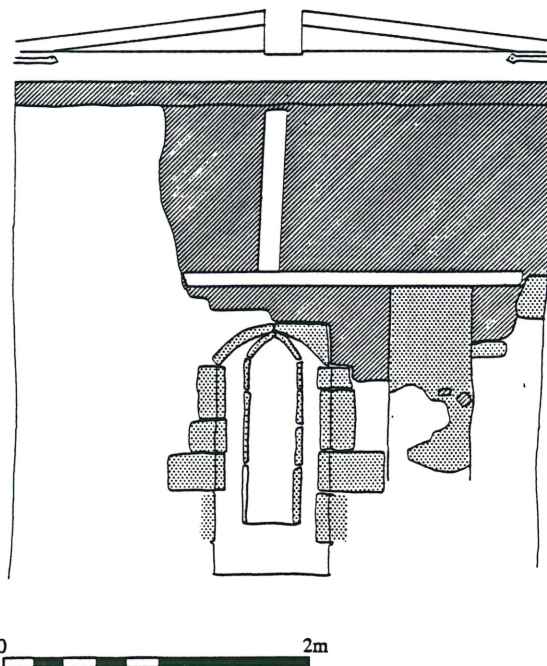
East wall internal elevation (Drawing by A. Baggs)
